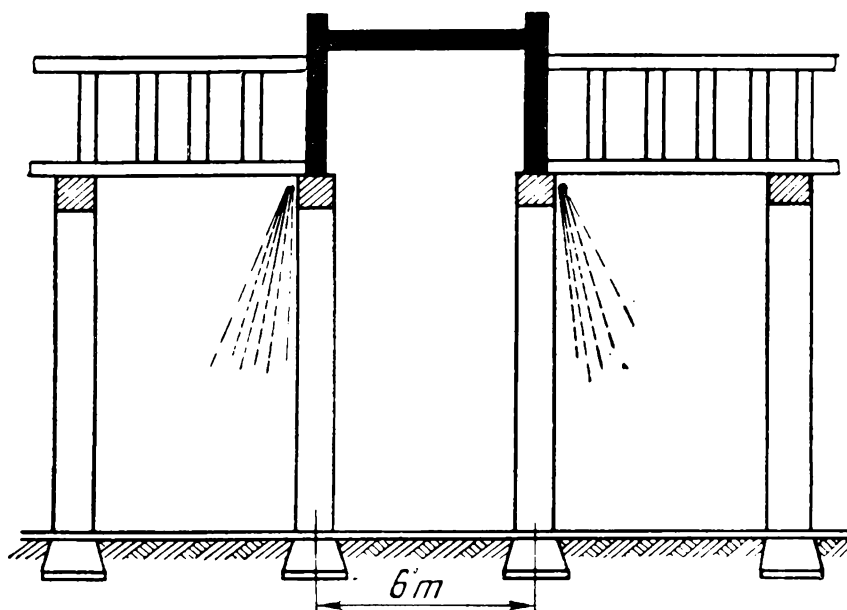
A construction of a fire-check zone with fire-drenching nozzles on both sides to arrest flames and check spread of fire through building
